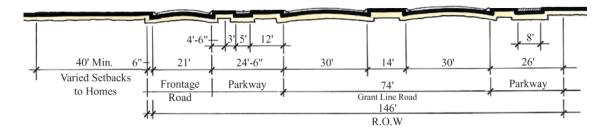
GRANT LINE ROAD CROSS SECTION (ADJACENT TO GRANT LINE VILLAGE)
